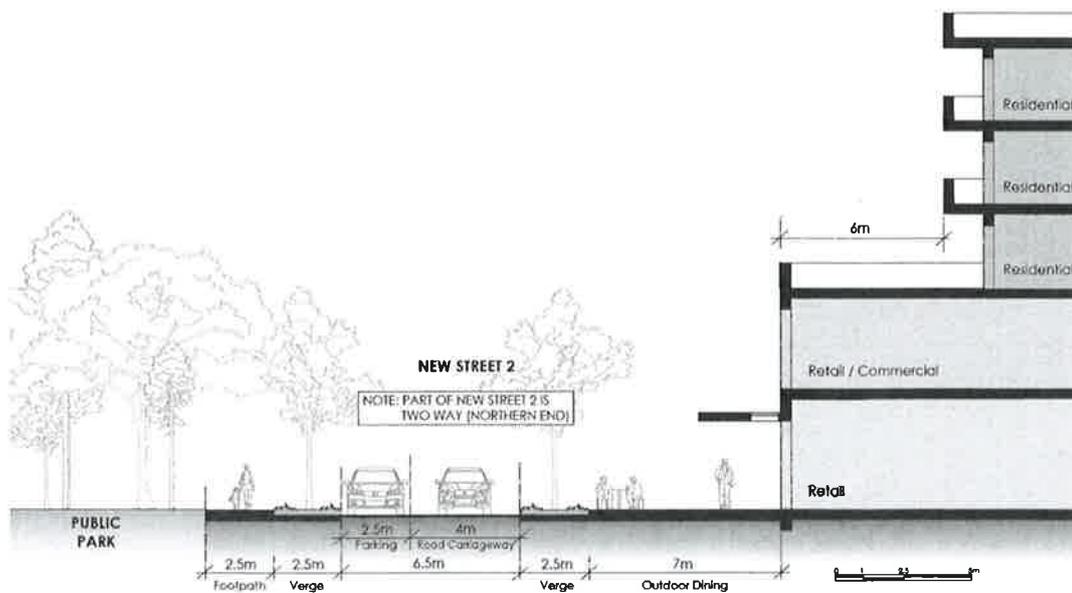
Figure: New Street 2 Setbacks – Southern End (Section B-B)
